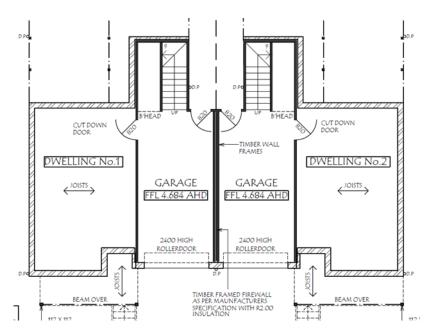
Extract of the proposed sub-floor of the dual occupancy
